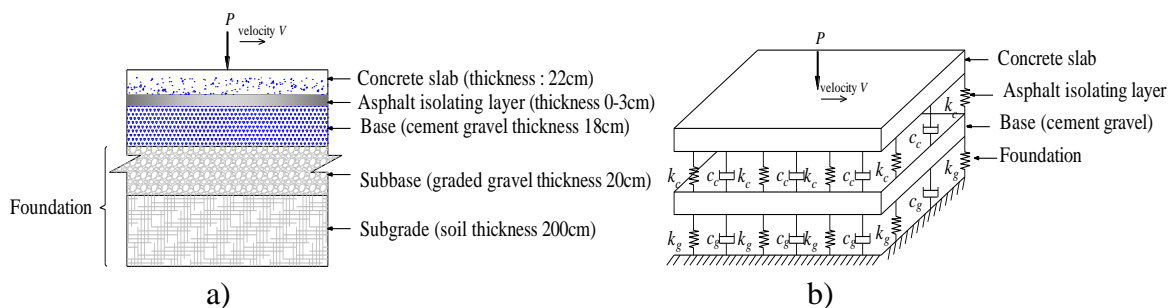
a) Concrete pavement structure; b) Concrete structure model.
